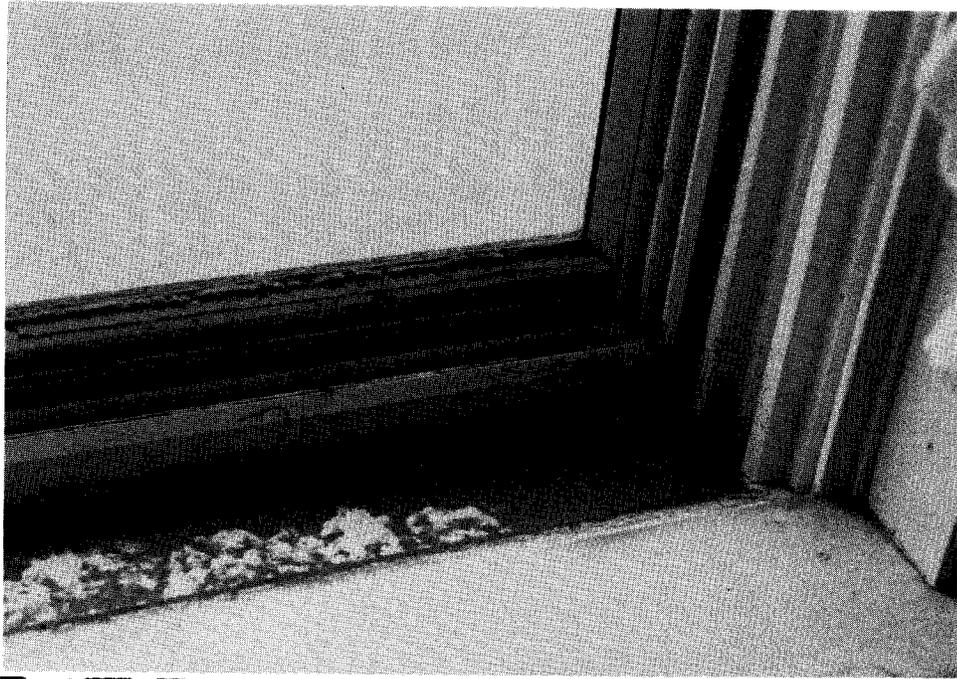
Keeper's Dwelling, typical interior window sill with wind-blown sand.
